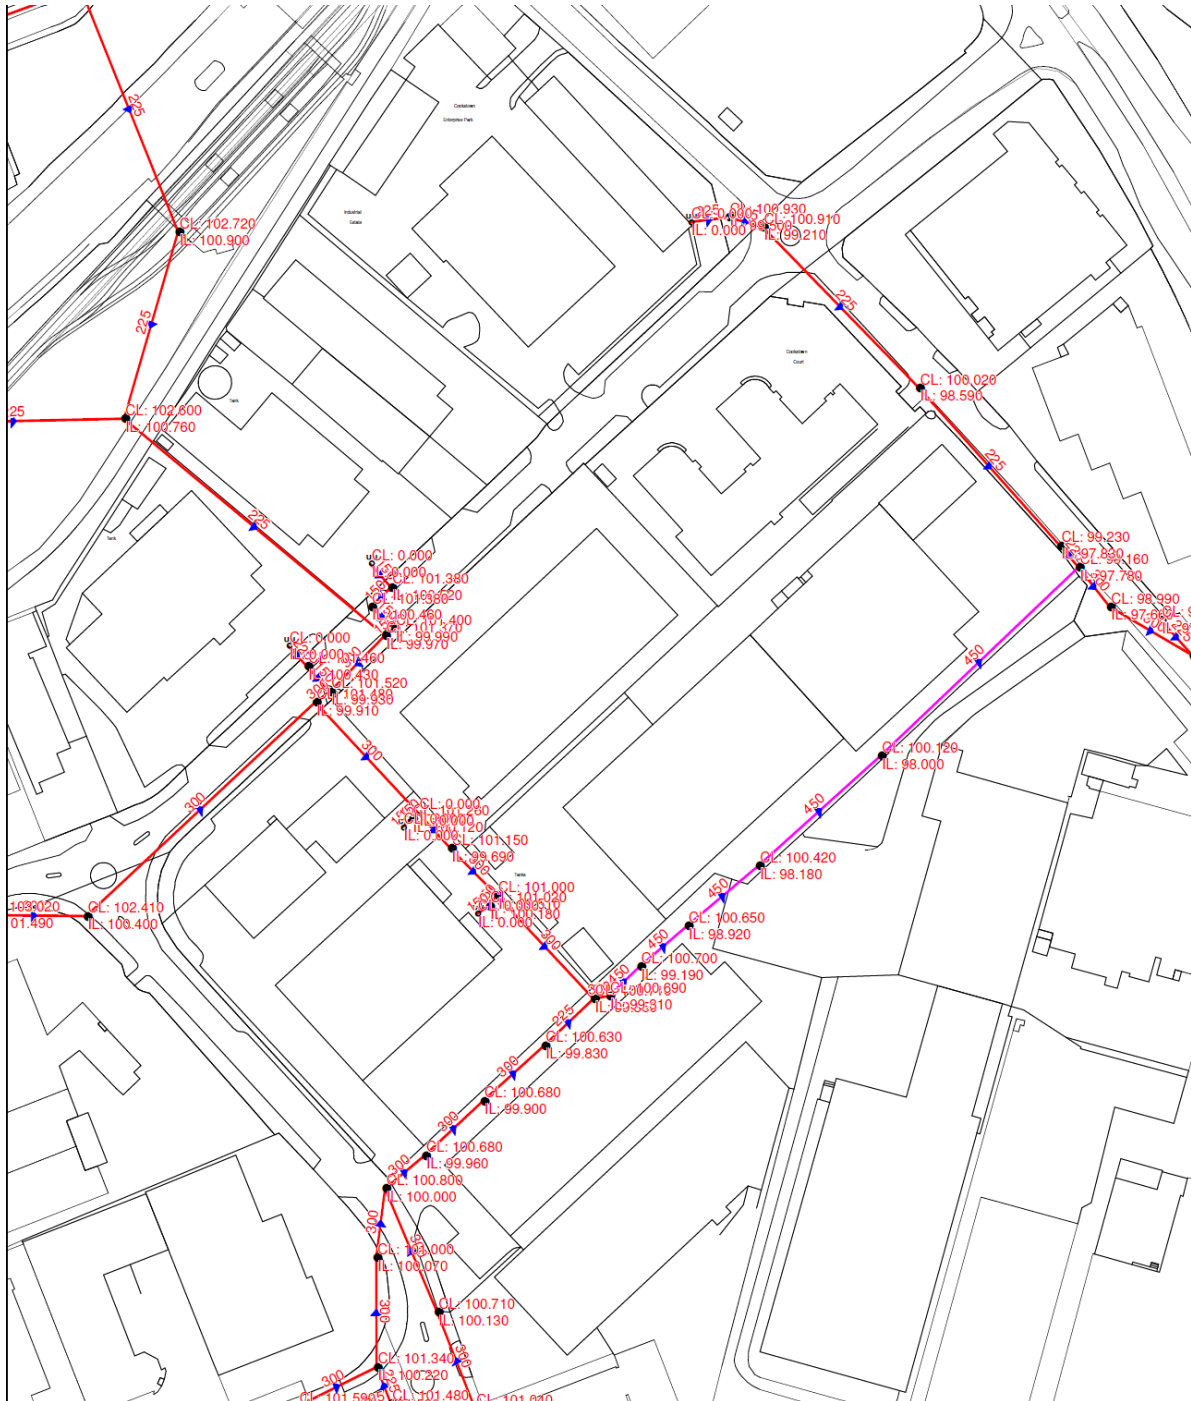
Map Extract from Irish Water Existing Foul Drainage Plan
